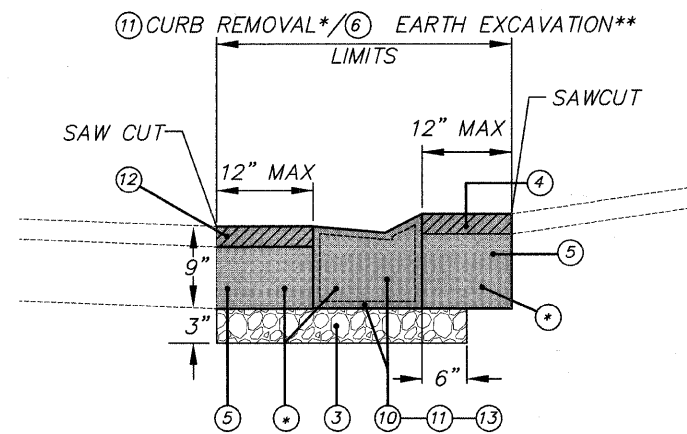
DETAIL SECTION SHOWN IS THROUGH DRIVEWAY FOR SIDEWALK THROUGH TURF REPLACE (4) & (5) WITH (9)
